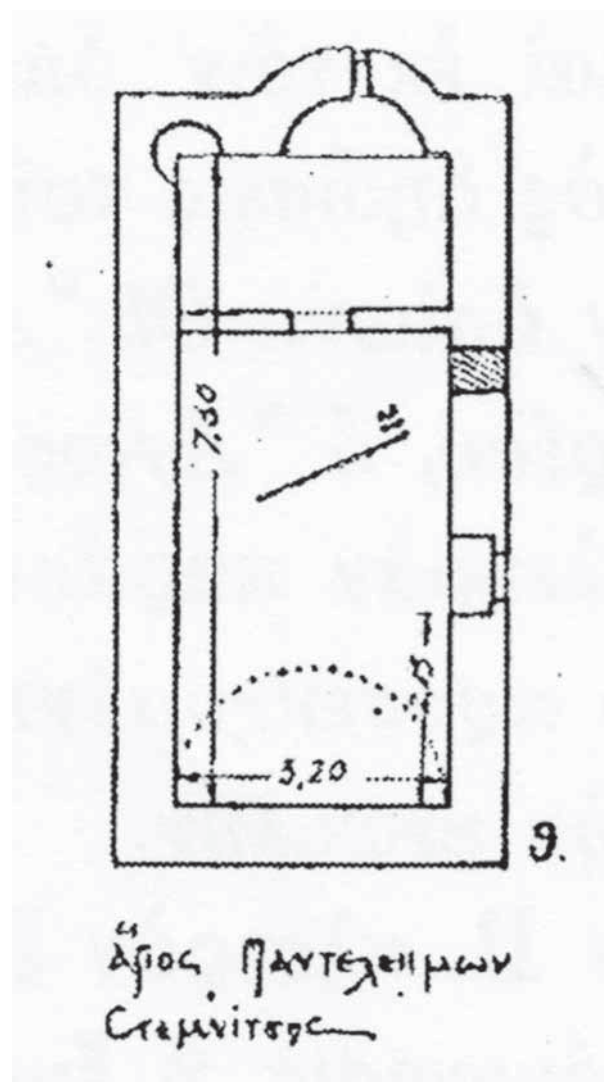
Plan of the Church of St Panteleemon in Stemnitsa
